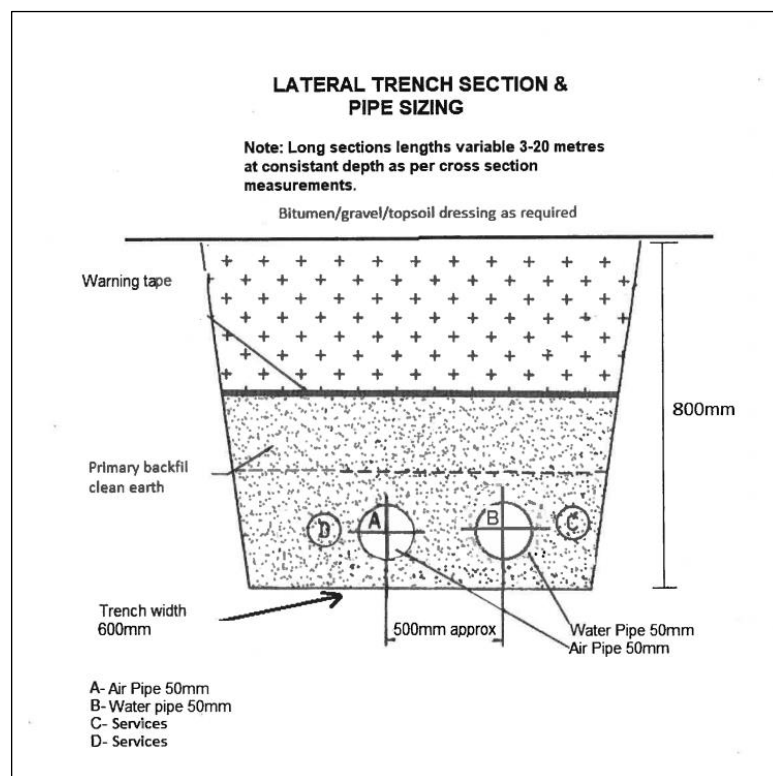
| Typical manual hydrant lateral trench section with pipe sizing (Source: Applicant's documentation)
